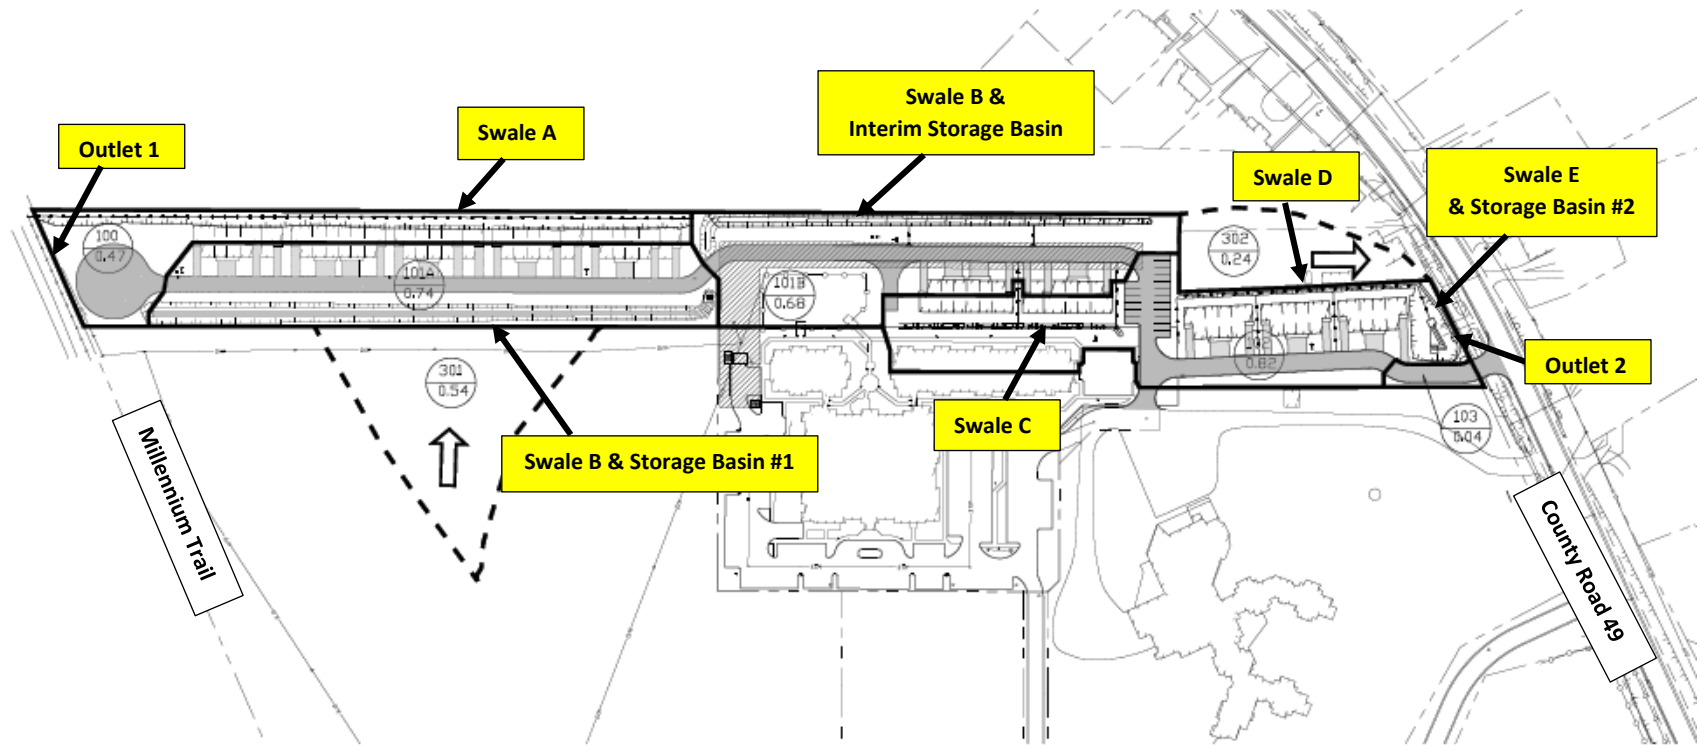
Summary of Grassed Swale and Outlet Locations with Proposed Phase 3 Development
